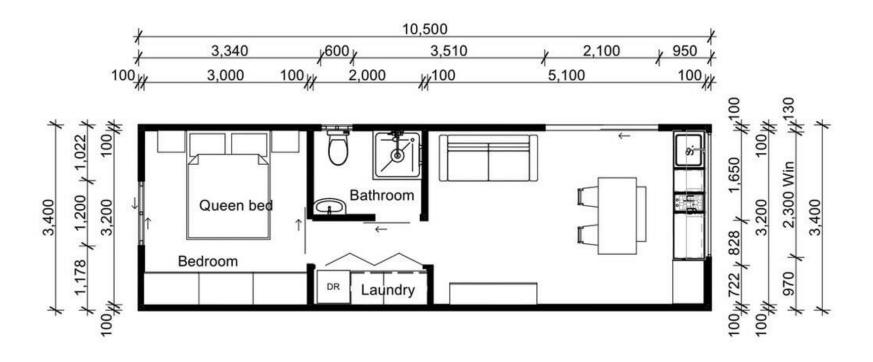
Approximate layout of single bedroom cabin – type 2 (indicative only)
